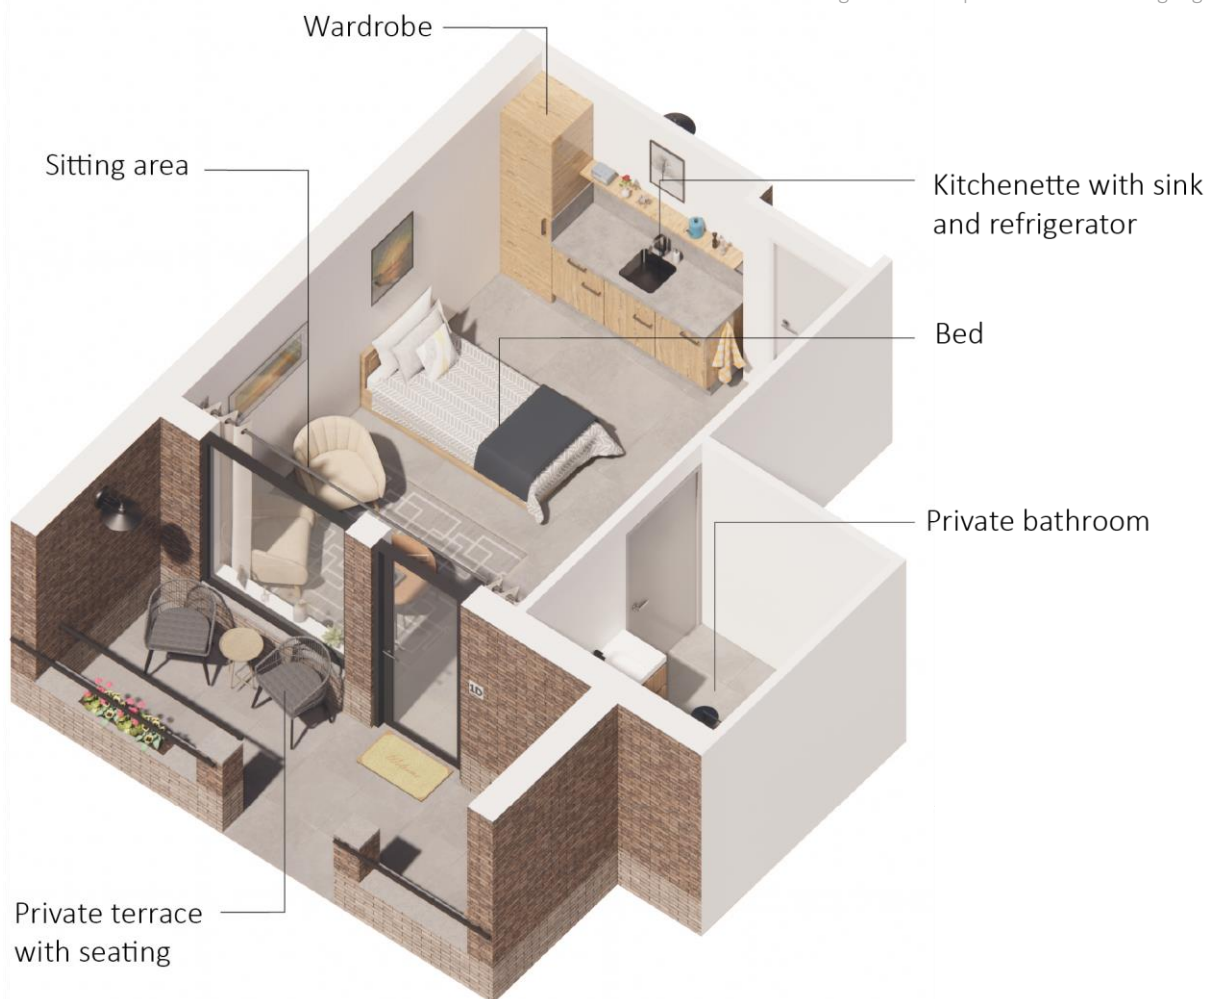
| Private Room with Private Terrace and Private Bathroom
